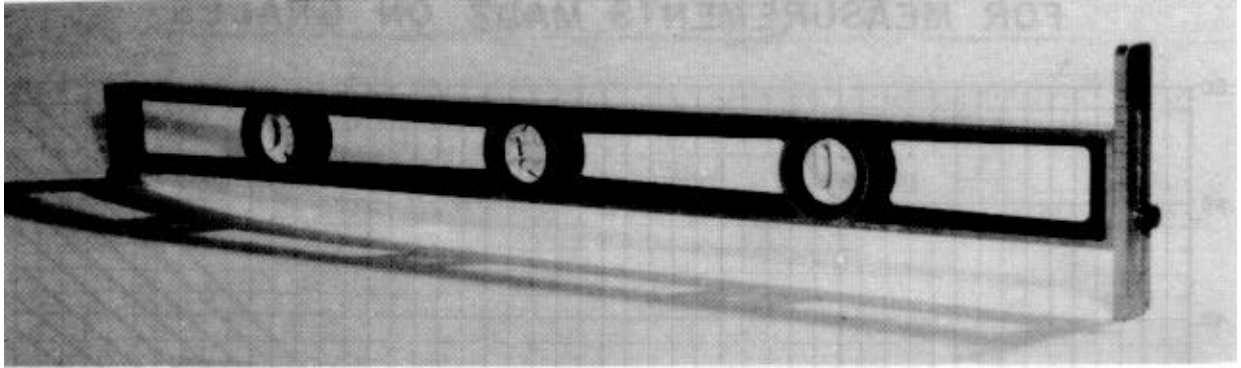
LEVEL FOR MEASURING PAVEMENT SLOPE
